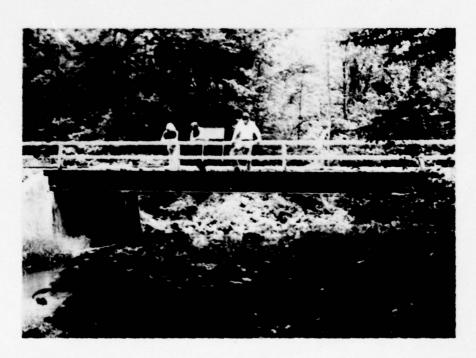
View of railroad bridge 1,700 feet downstream of dam.
